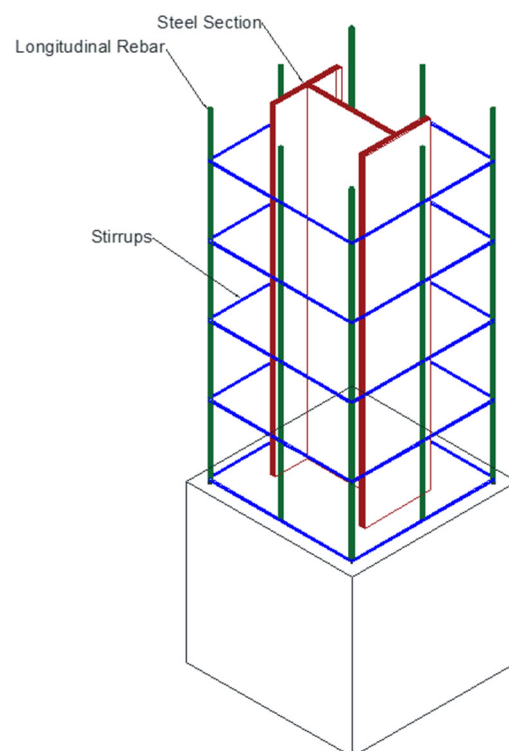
Configuration of the concrete pier for concrete-encased steel (CES) section.
